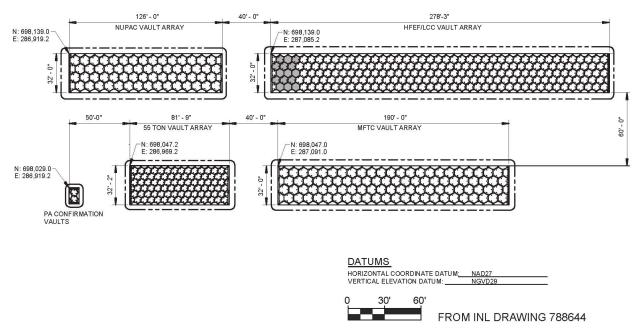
Horizontal layout of the disposal vault arrays at the RHLLW Disposal Facility.
